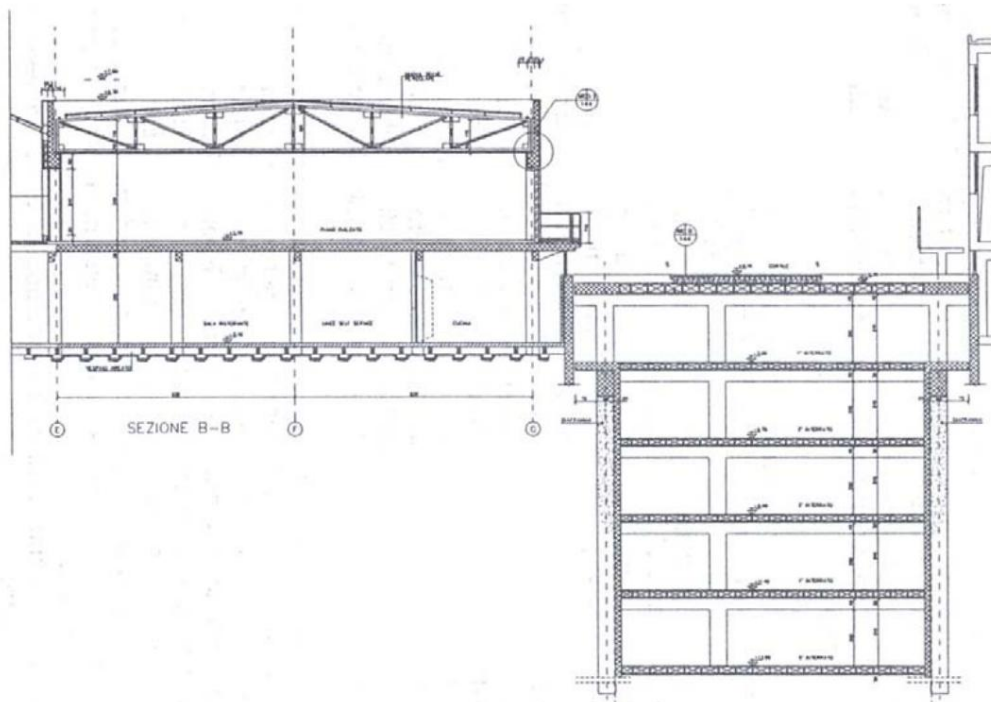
Underground garage project Serviced by Bayer Italia in Milan. The garage, featuring five underground levels, is nestled between two existing buildings.
